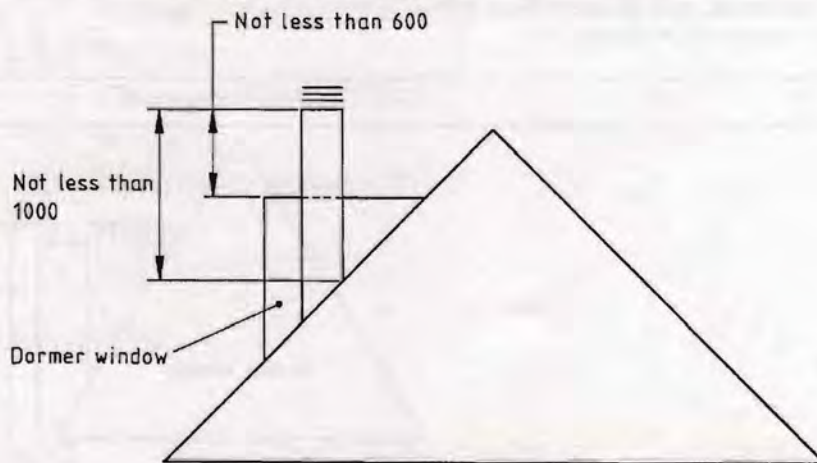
Pitch roof, chimney within 1.5m from dormer window measured horizontally
